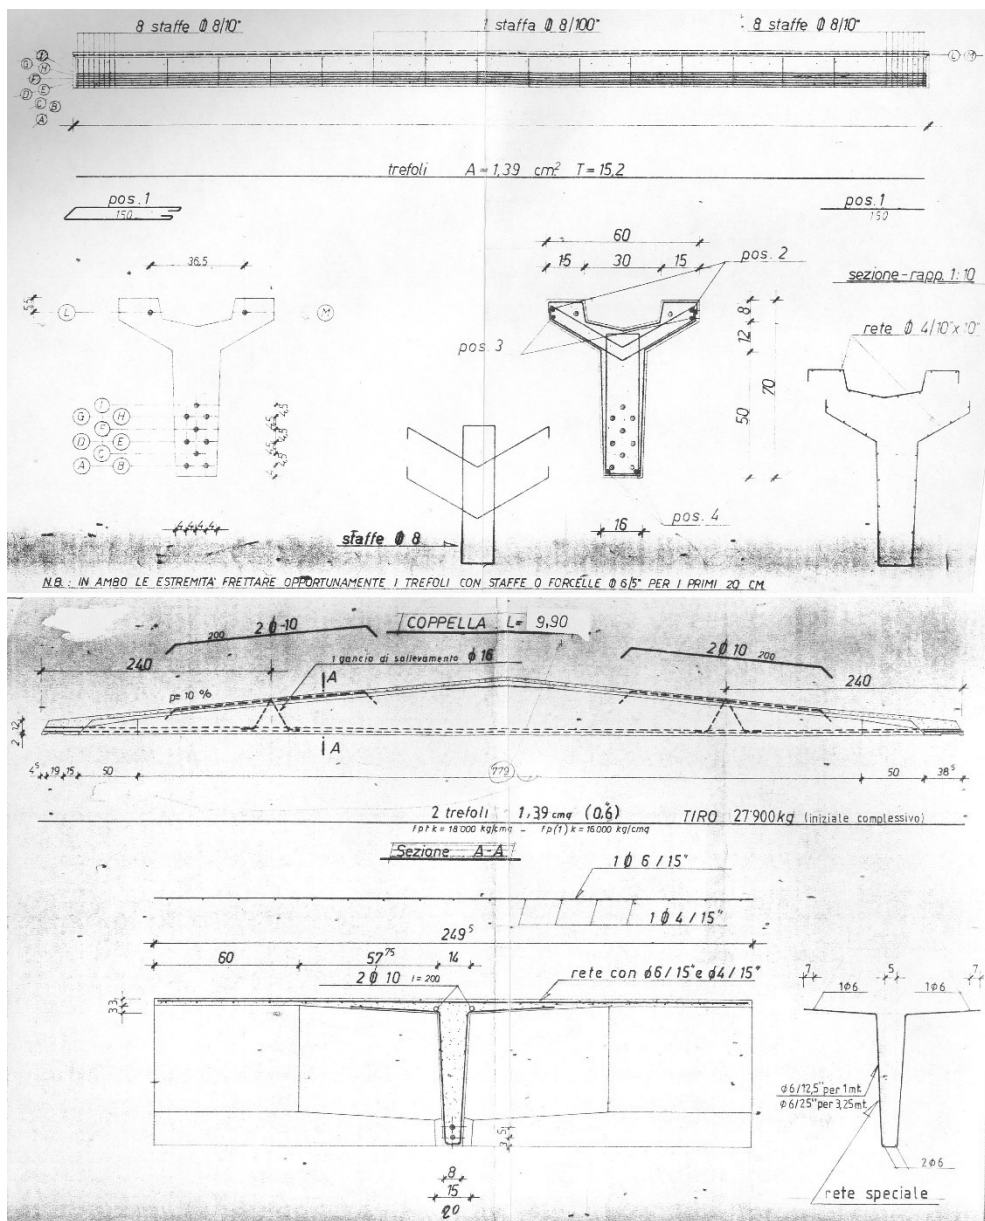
Details concerning reinforcement of prestressed beams and tiles of the preliminary case study.
